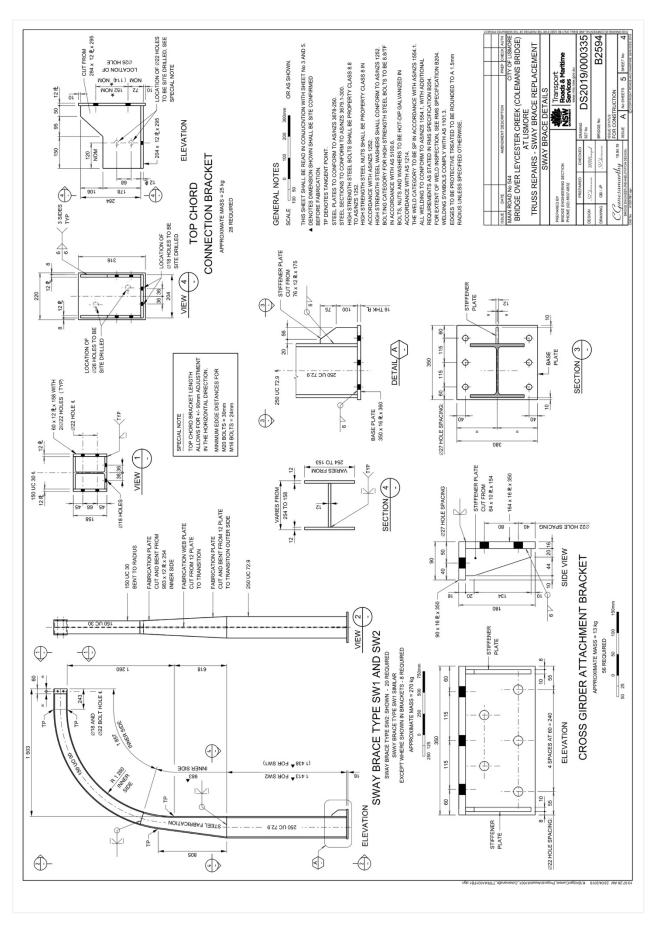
PROPOSED TRUSS REPAIRS - SWAY BRACE REPLACEMENT - DETAIL
